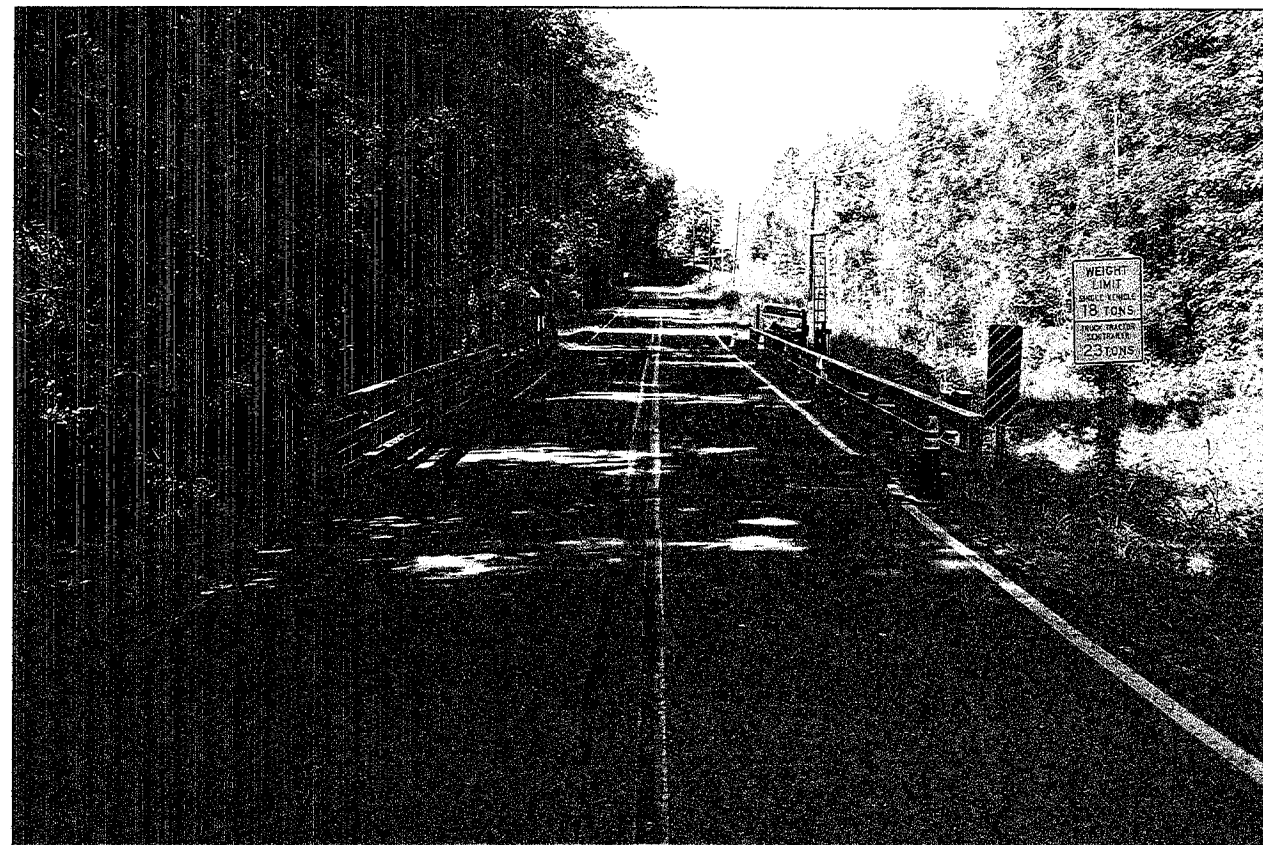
CENTERLINE PROFILE (-L-), LOOKING DOWNSTATION
